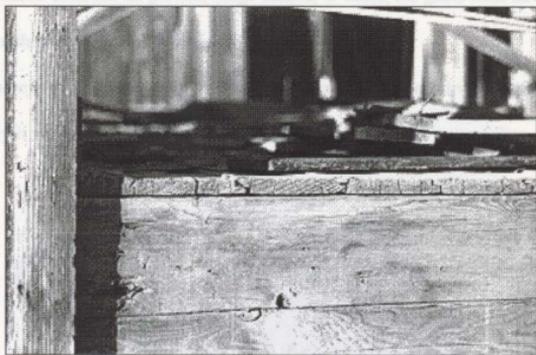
Indian Shaker Church, Detail Showing the Lap Jointed Floor Boards.
